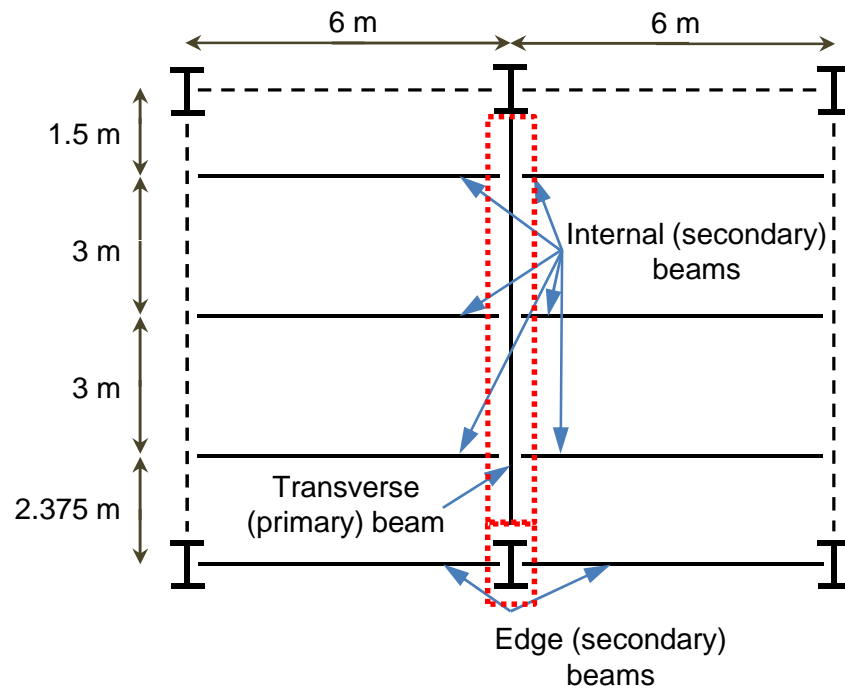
Plan view of the floor area surrounding the column (adapted from Vlassis et al. [195]).
